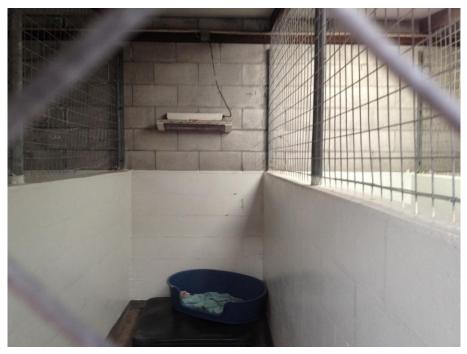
Interior view of typical dog shelter space with transverse half height concrete masonry partitions
